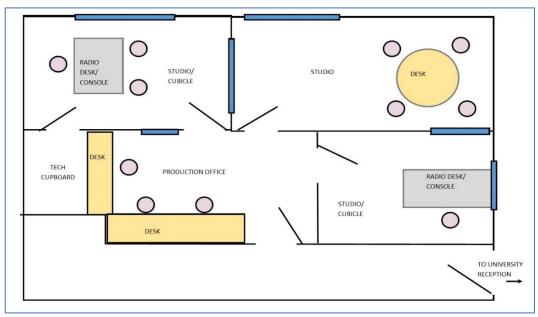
Radio LaB studio layout based on floorplan provided (not to scale)
